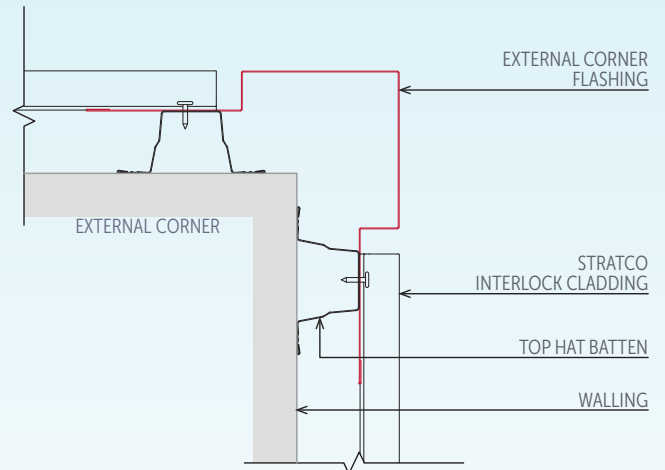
EXTERNAL CORNER WALL FLASHING DETAIL (PLAN VIEW)
